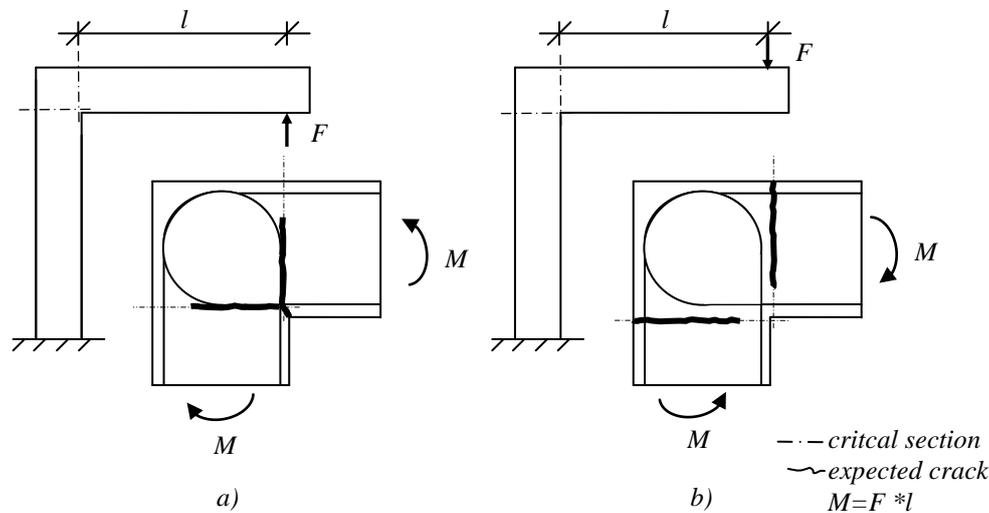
Testing of frame corners, a) concrete frame corner subjected to an opening moment, b) concrete frame corner subjected to a closing moment. The thick lines in a) and b) show where the expected critical cracks occur. The figure is based on Johansson (2000).
